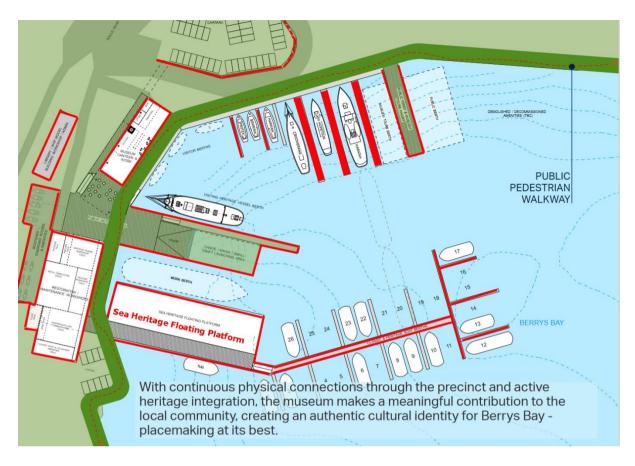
The SHF plan with wharves and buildings outlined in red.
